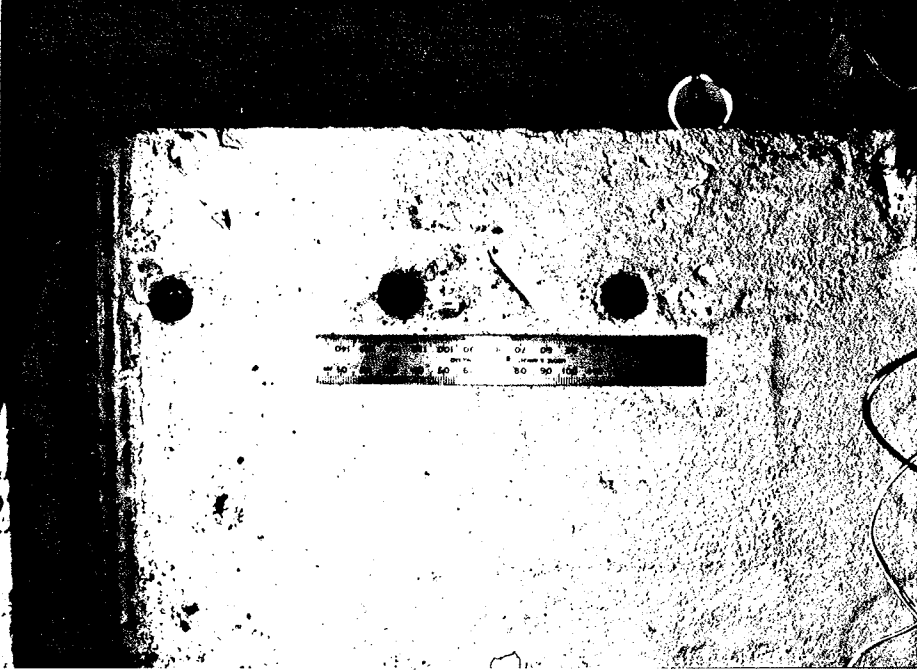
SPACE BETWEEN STUDS AND SURROUNDING CONCRETE
